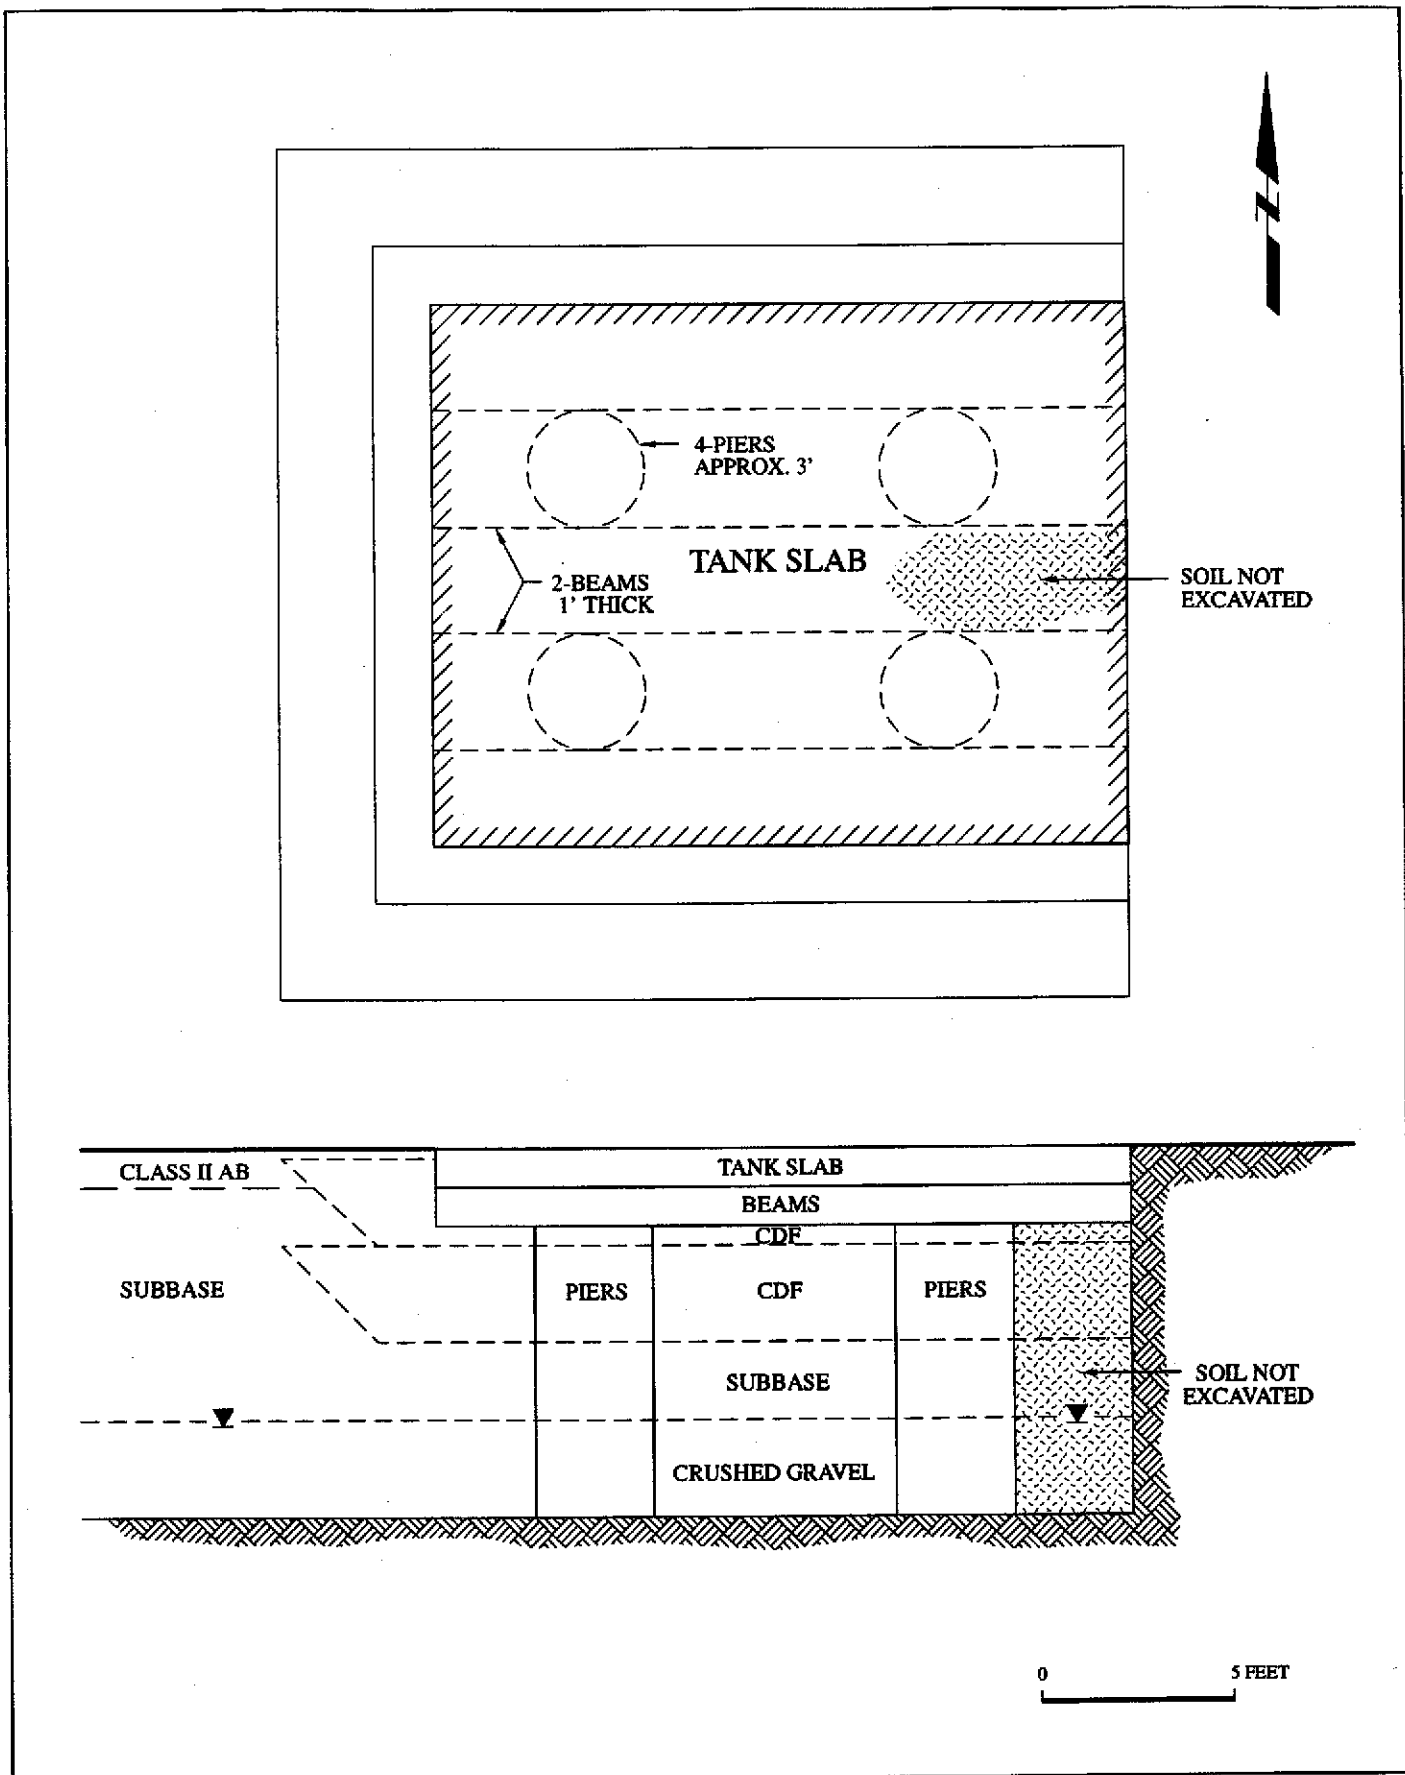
PLAN AND CROSS-SECTIONAL VIEW OF GRANULAR FILL AND CONTROL DENSITY FILL PLACEMENT
